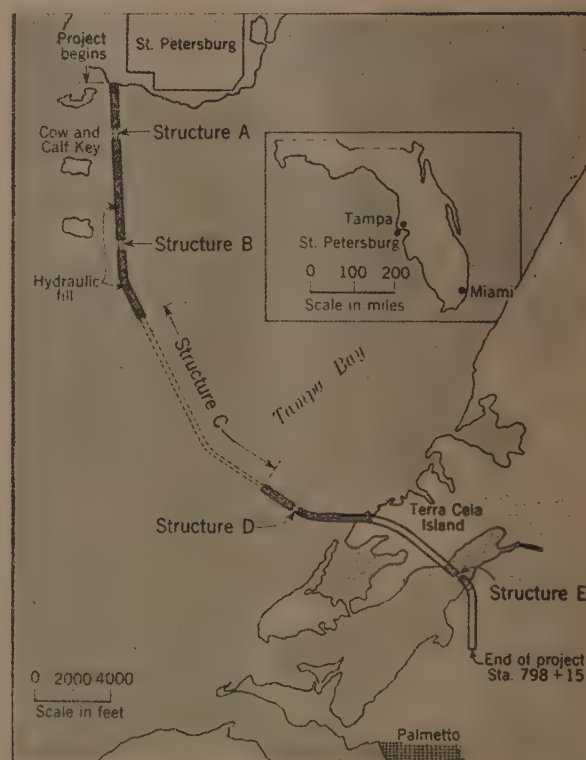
Lower Tampa Bay Bridge, Florida—Location plan
